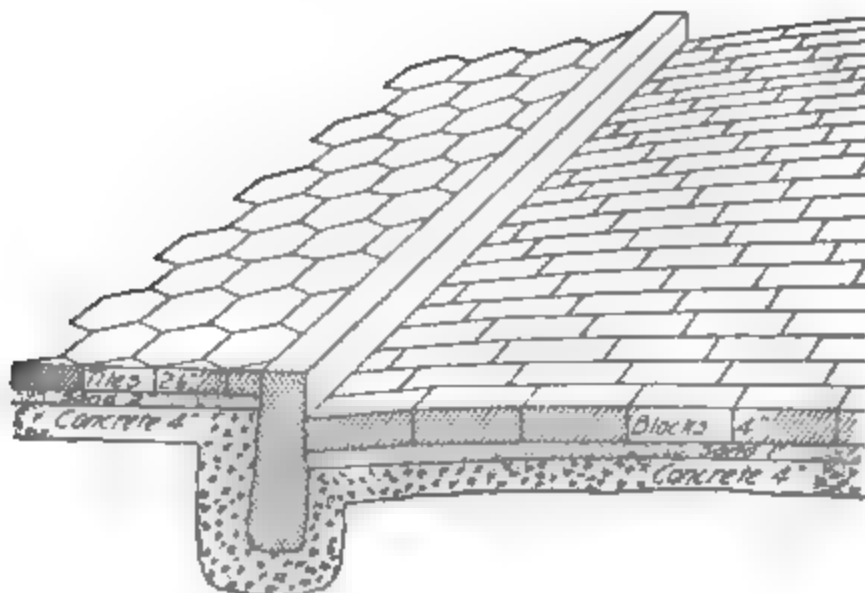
ASPHALT BLOCK PAVEMENT.
